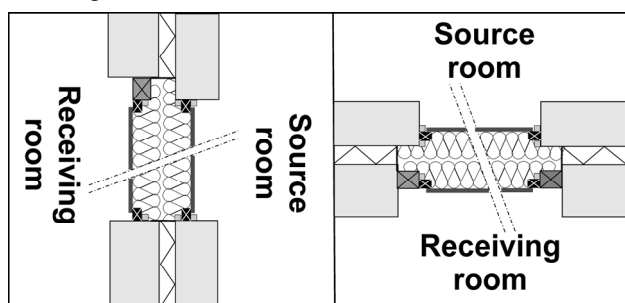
Test specimen “LvA2” – double leaf gypsum board on two wooden frames with no structural connections between the leaves (left: vertical cut; right: horizontal cut)
